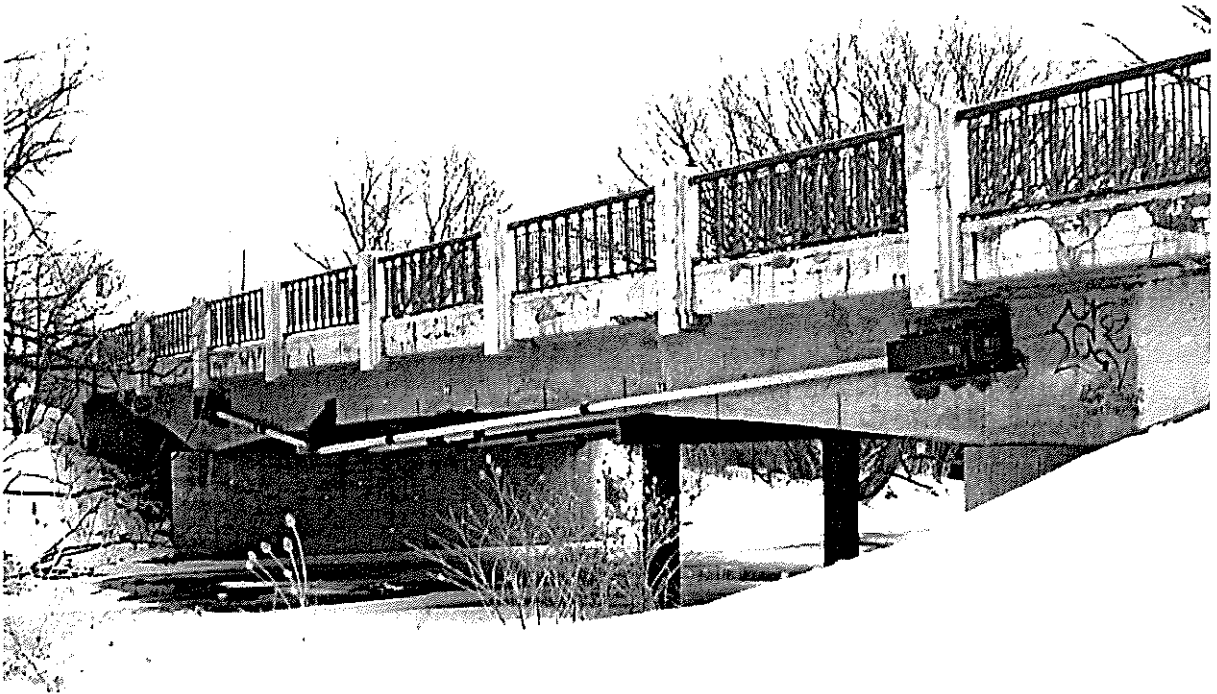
External Prestressing Being Used to Strengthen a Concrete Bridge
